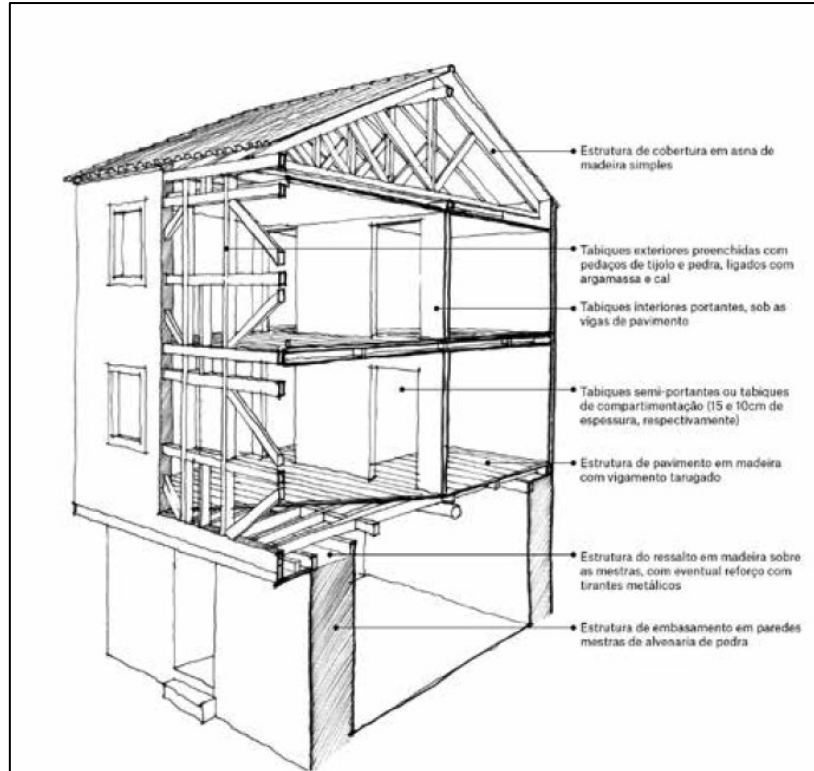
Medieval building stepped at 1st floor ((O.A., 2016)
